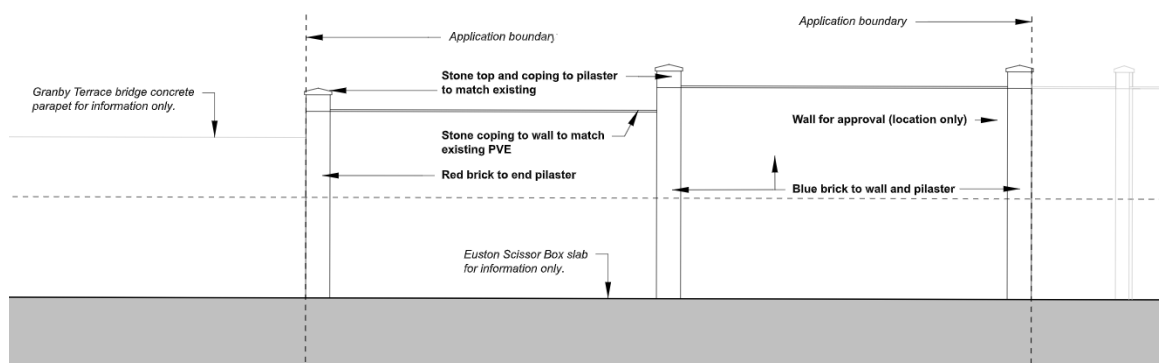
North Elevation (Drawing Reference: 1MC03-SCJ_SDH-AR-DGA-SS01_SL03-040013)
